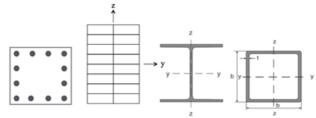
Cross-sections of the different columns investigated, reinforced concrete, glulam, HEA/HEB and VKR.
